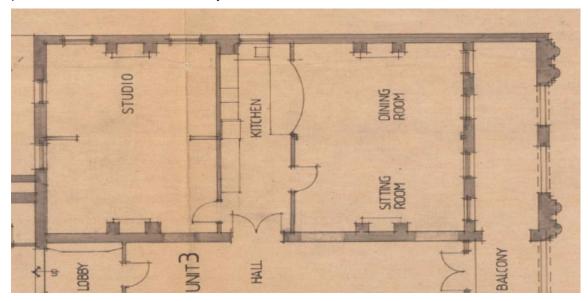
Screenshot of first floor east facing Biltmore windows. Source: Endorsed plans of the Biltmore Building, Planning permit S3378. 23 July 1993.
